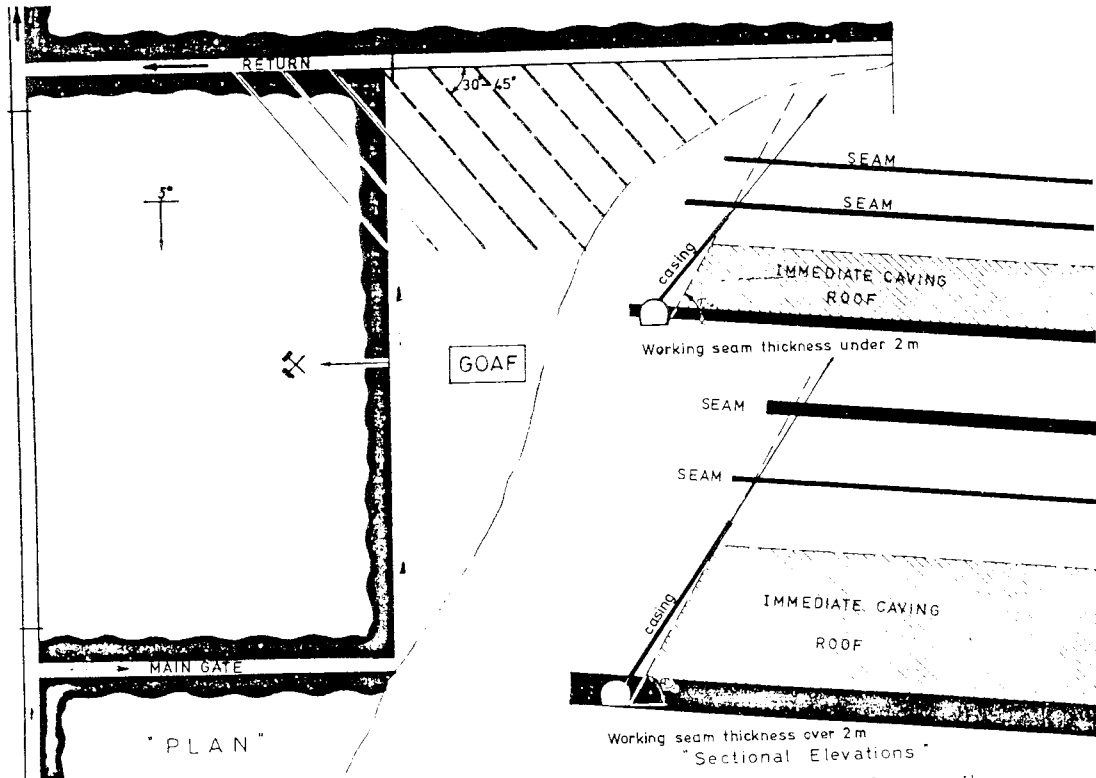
Single entry retreating longwall with caving - retreating along strike
